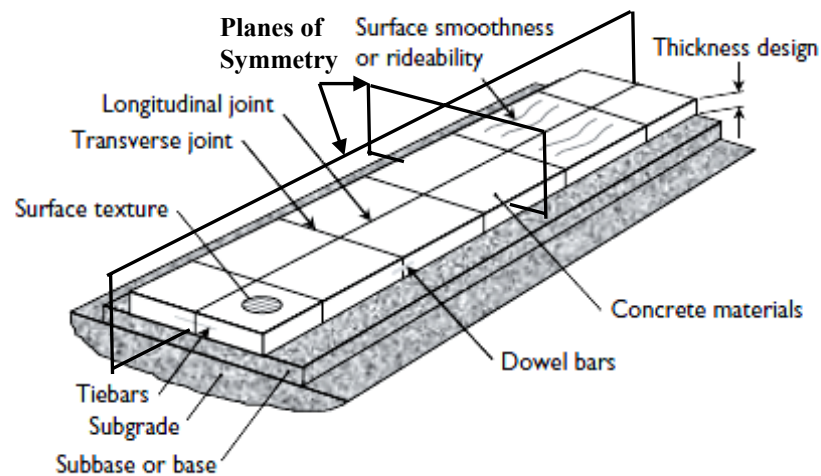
Schematic Diagram of a Jointed Plain Concrete Pavement
